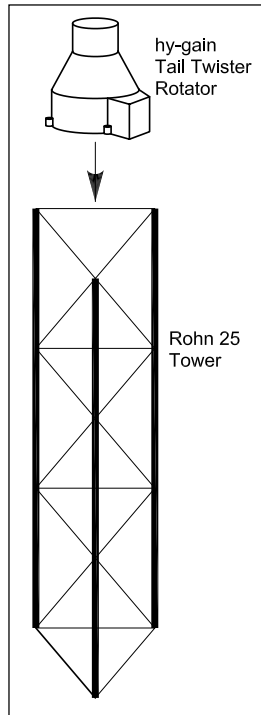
WA0KKC points out that TailTwister rotators can be used in Rohn 25 towers. Simply remember to insert the rotator from the end of a tower section.
